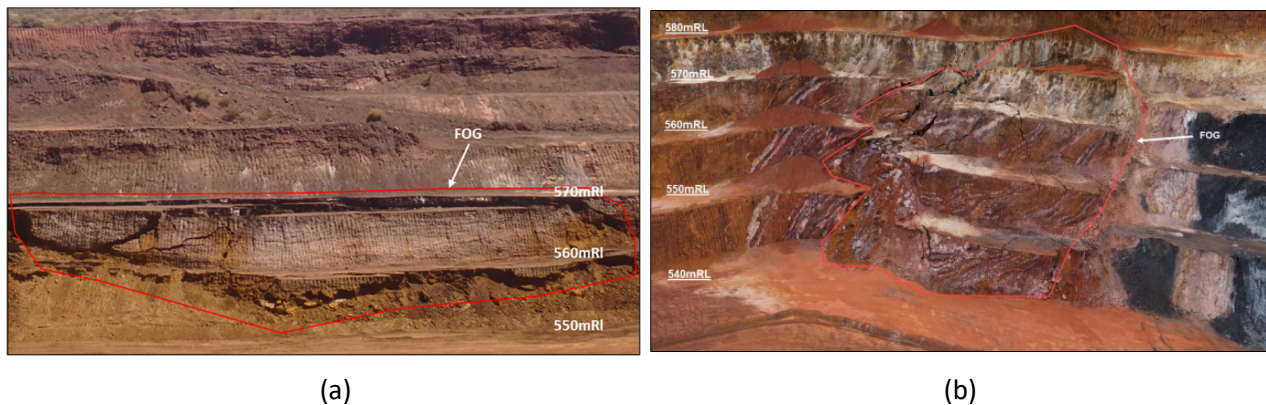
Examples of instability along bedding planes in open pit iron ore mines in the Pilbara region. (a) Planar sliding failure along a shale band; (b) Wedge failure along a shale band contact and a Fault plane
